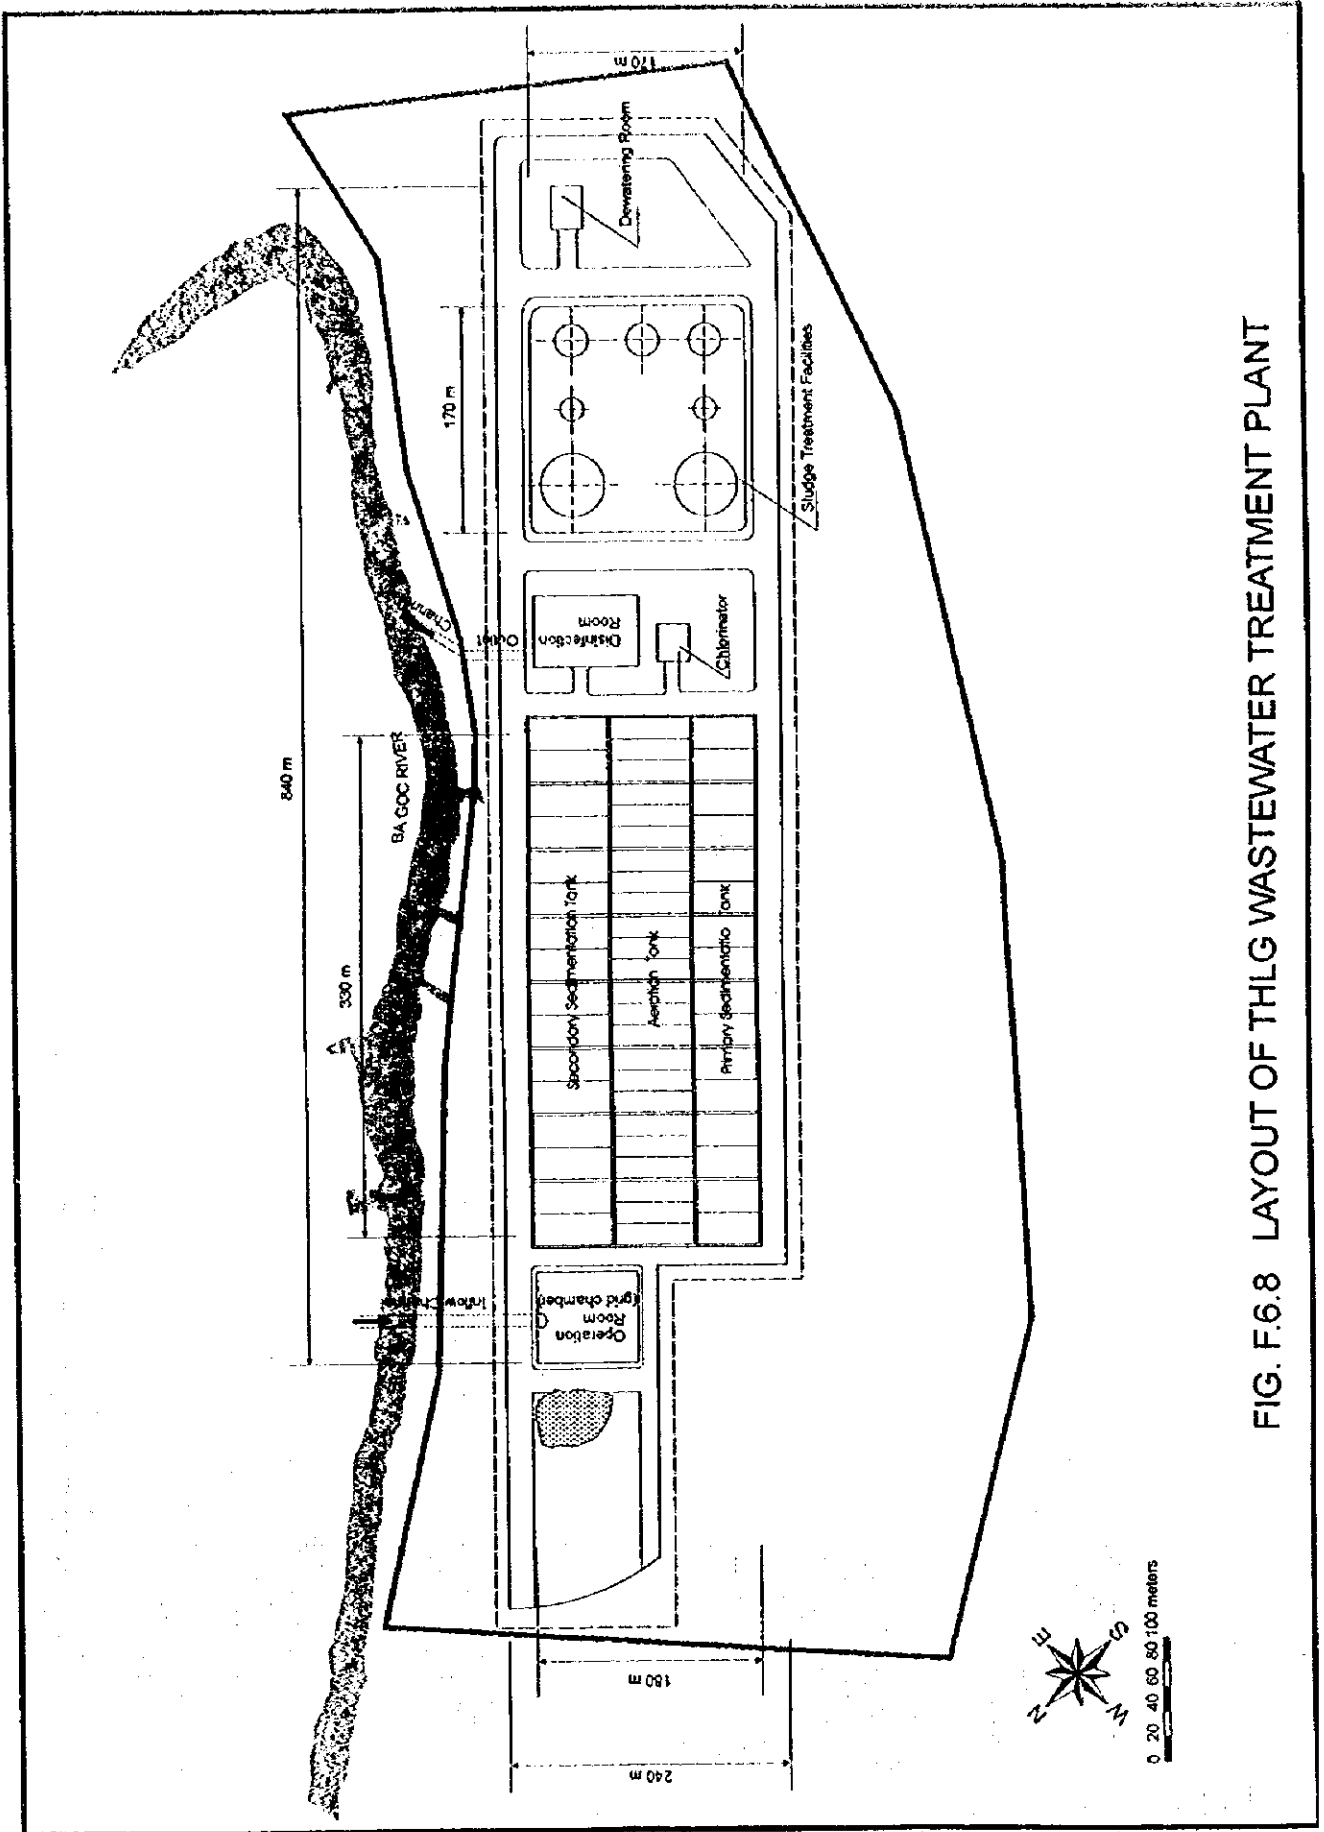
LAYOUT OF THLG WASTEWATER TREATMENT PLANT
